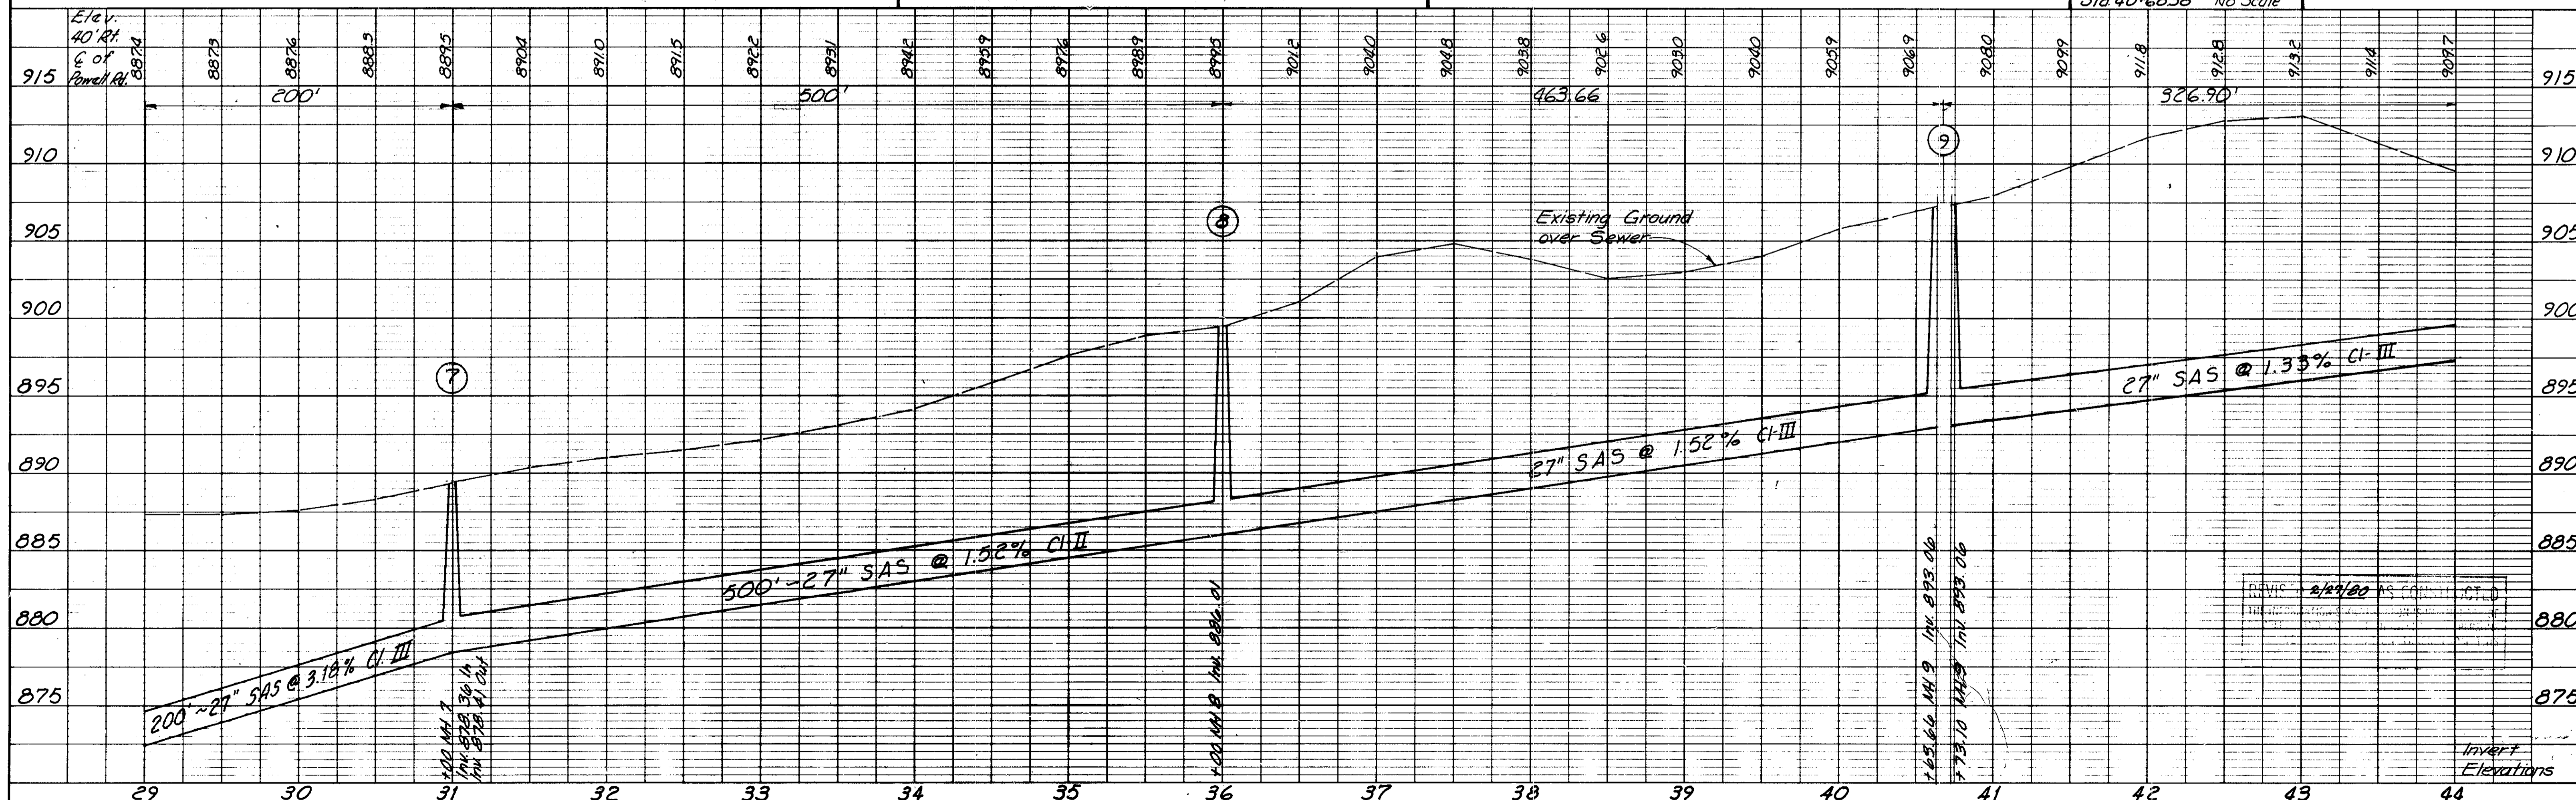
PLAN-PROFILE B.P.R. STANDARD
